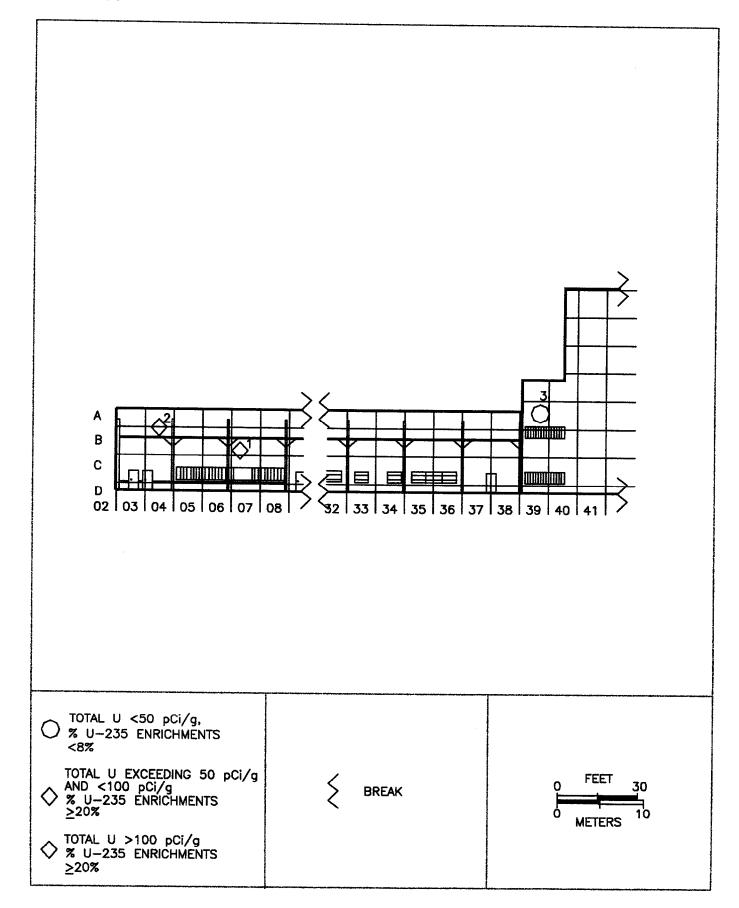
Building 3, East Wall — Measurement and Sampling Locations
